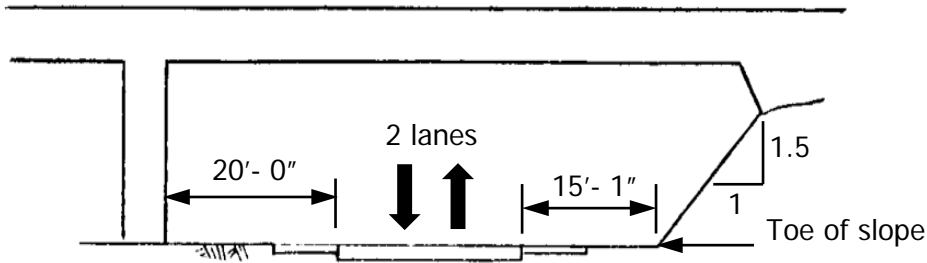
Bridge elevation view of horizontal clearances for a 2-lane highway with 2-way traffic below the bridge.
